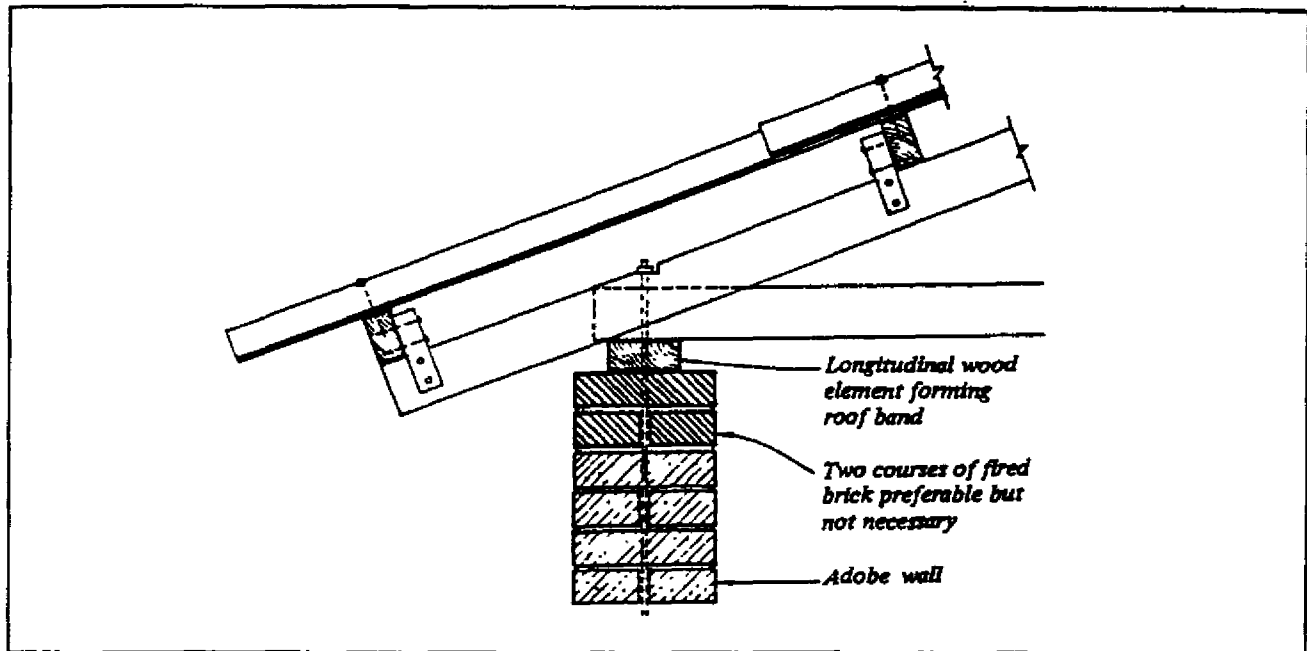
Use of Longitudinal Wood under Roof Rafters [2].
